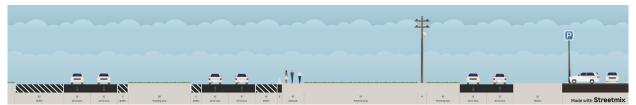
IL-116 looking SW at Upper Free Bridge Rd (proposed approximate cross-section with trail adjacent to IL-116)
